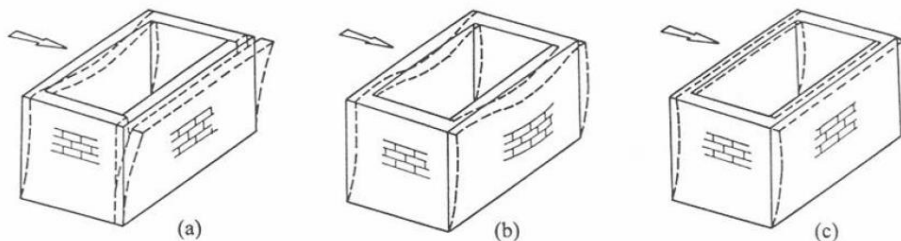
Effect of diaphragm type on face-loaded walls a) poor wall-wall connection and no diaphragm, b) good wall-wall connection and flexible diaphragm, c) good wall-wall connection and rigid diaphragm [15]
